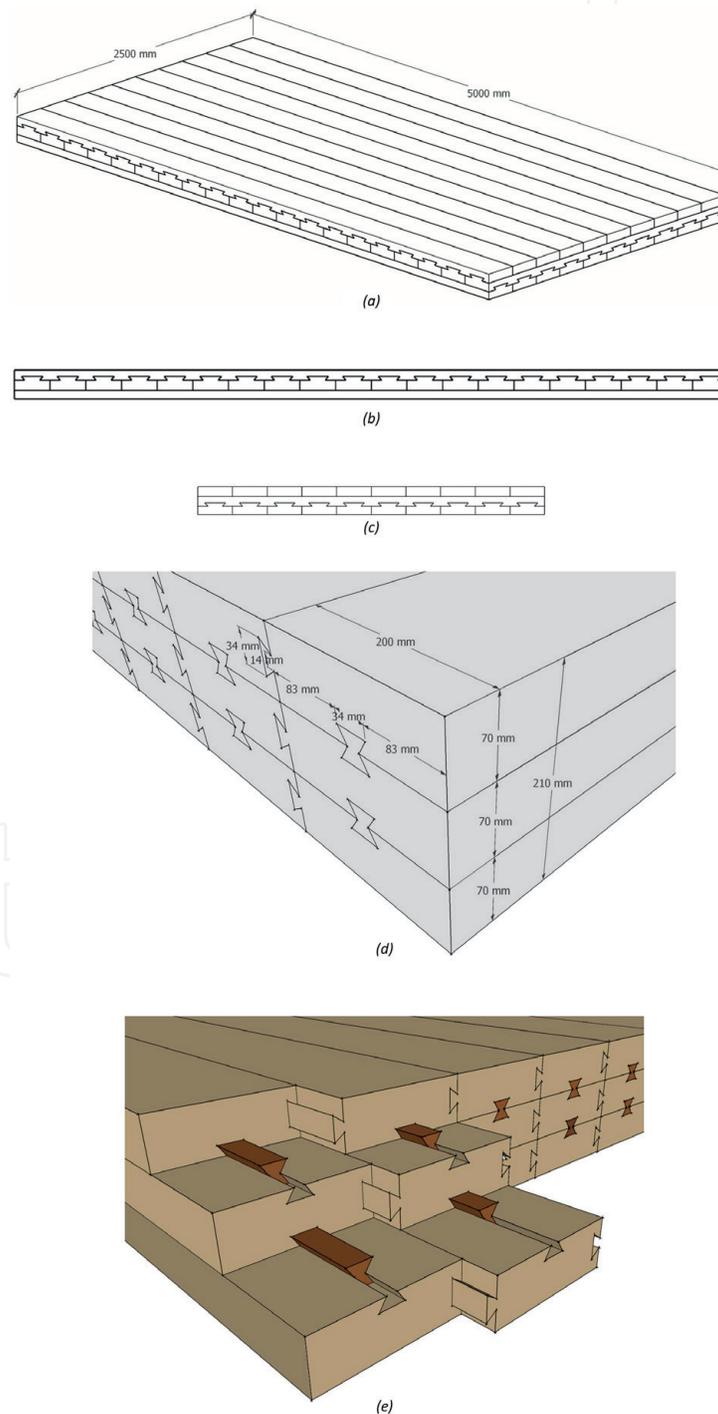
Dovetail wood elements as floor slab alternative-2 (key type): (a) isometric view; (b) front view; (c) side view; (d) with representative dimensions; (e) detail.
